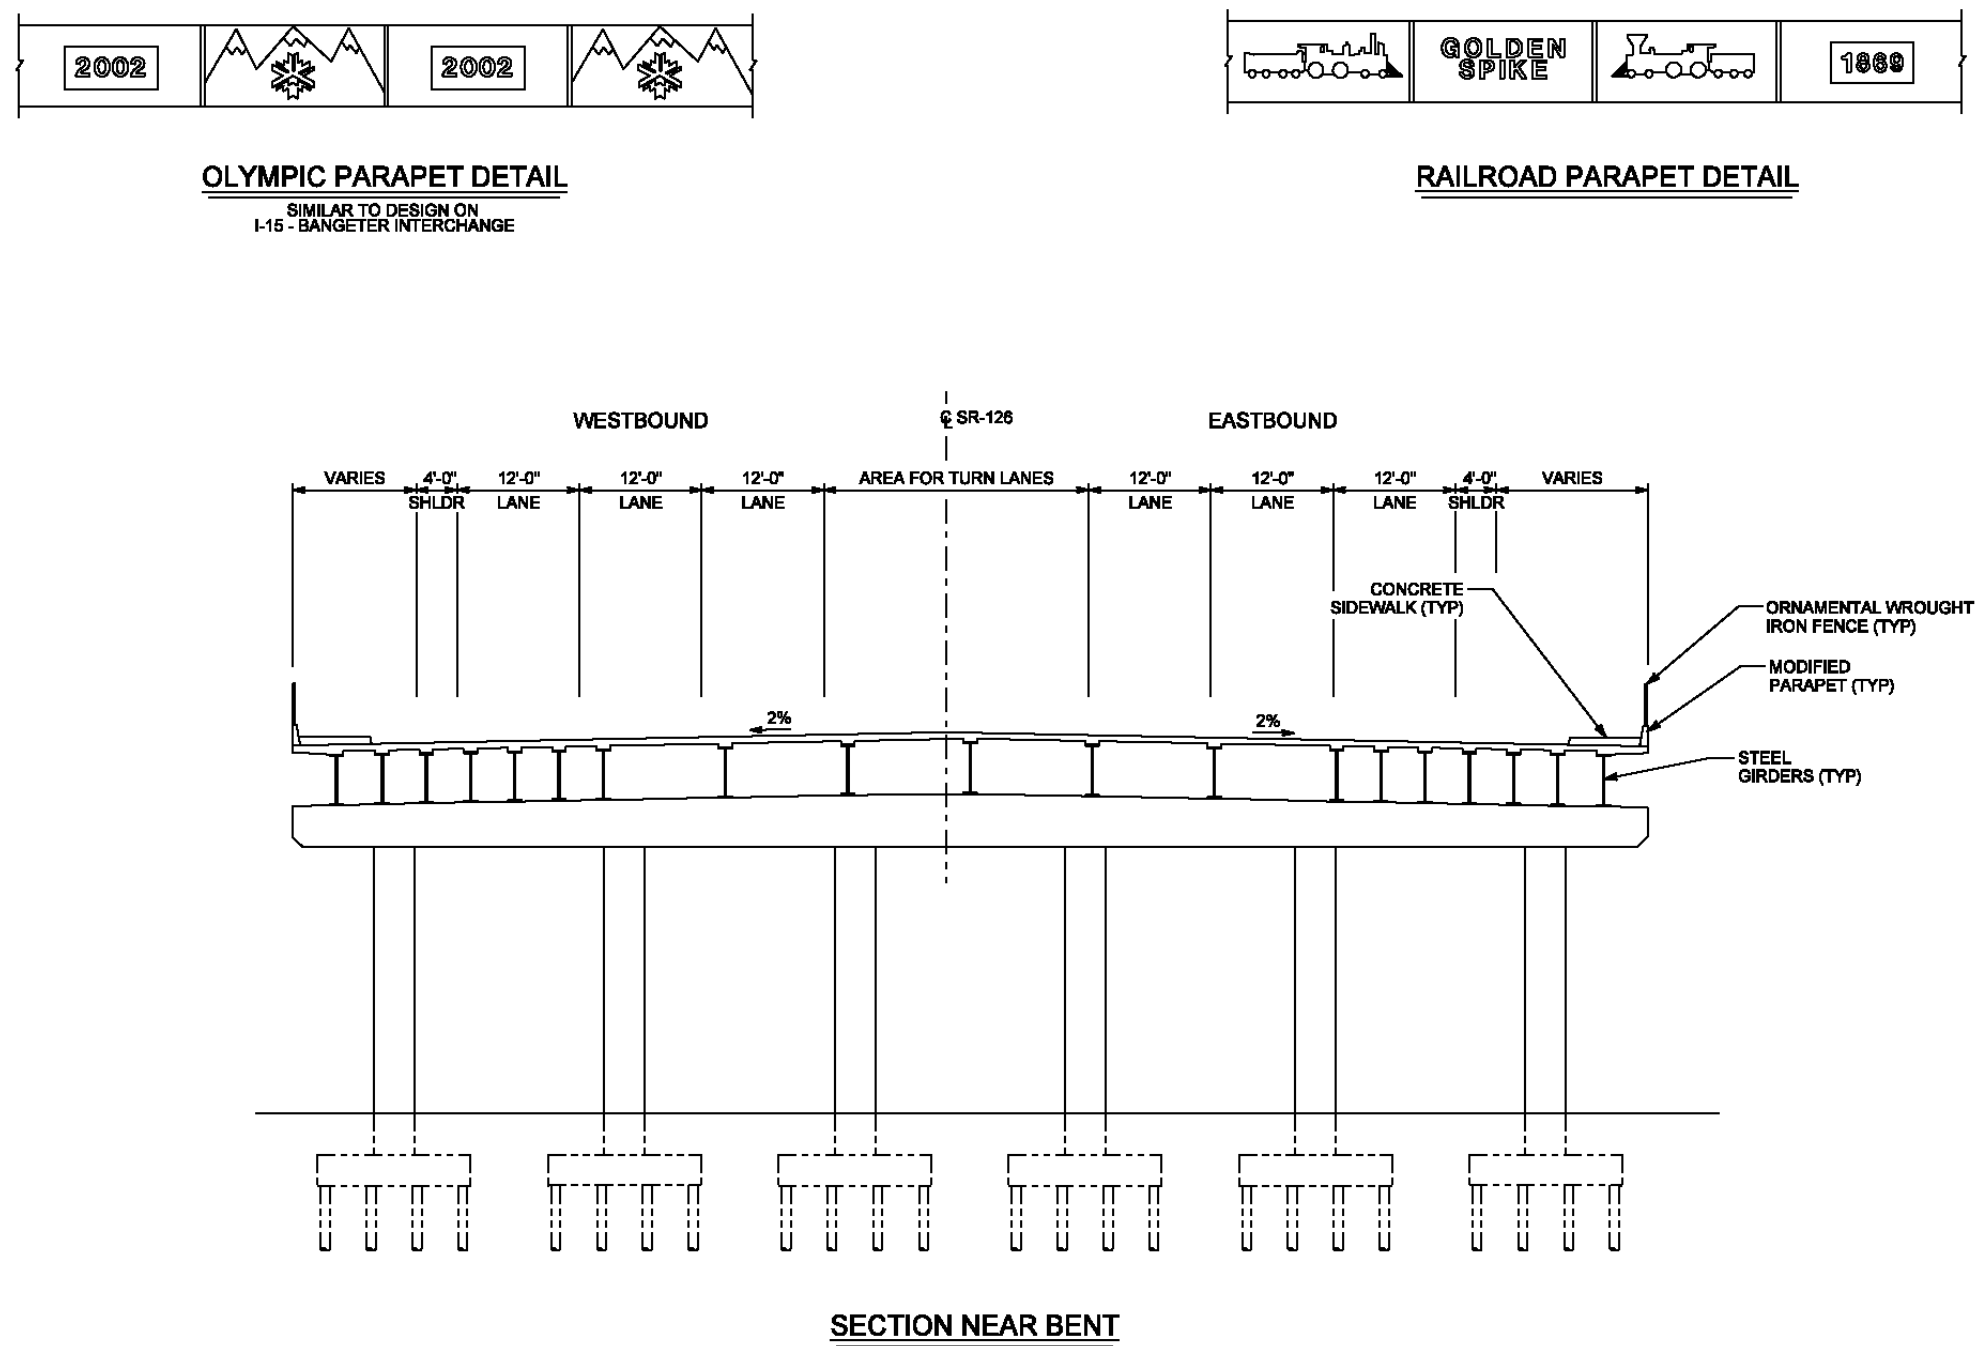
Preliminary Layout of I-84 Bridge (Page 2 of 2).
